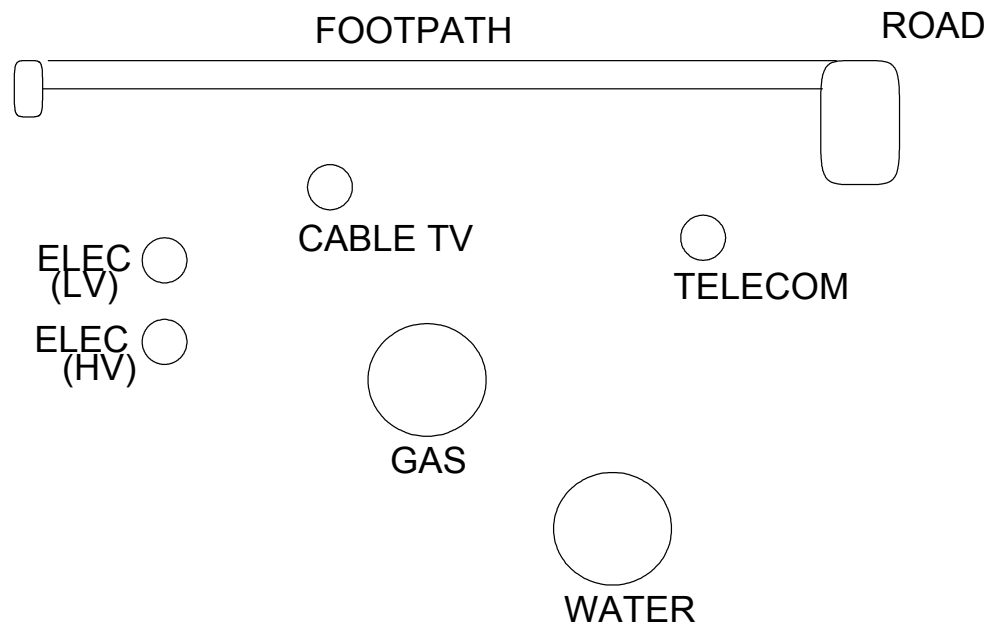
TYPICAL SECTION OF PLANT IN FOOTWAYS
